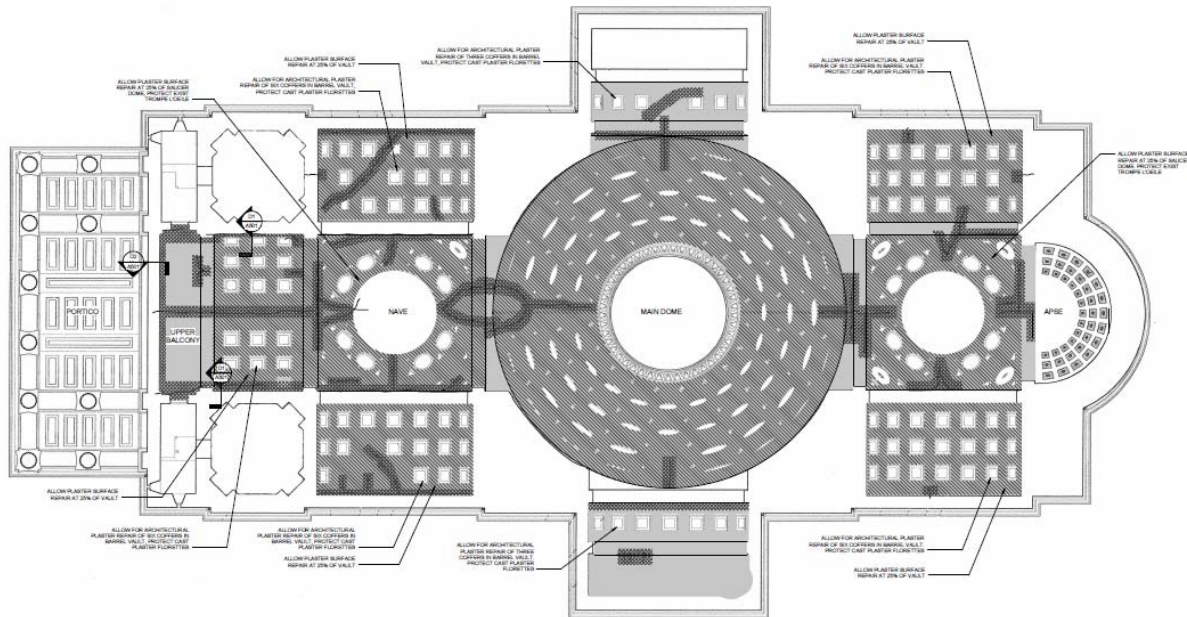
Reflected Ceiling Plan - Plaster / Masonry Crack Repairs.
